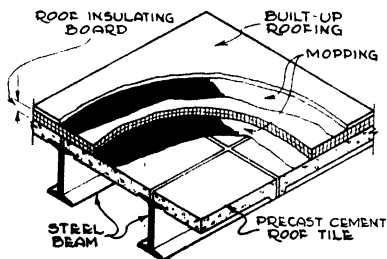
Precast Cement Tile Roof Deck, Roof Insulation Board, and Built-up Roofing
